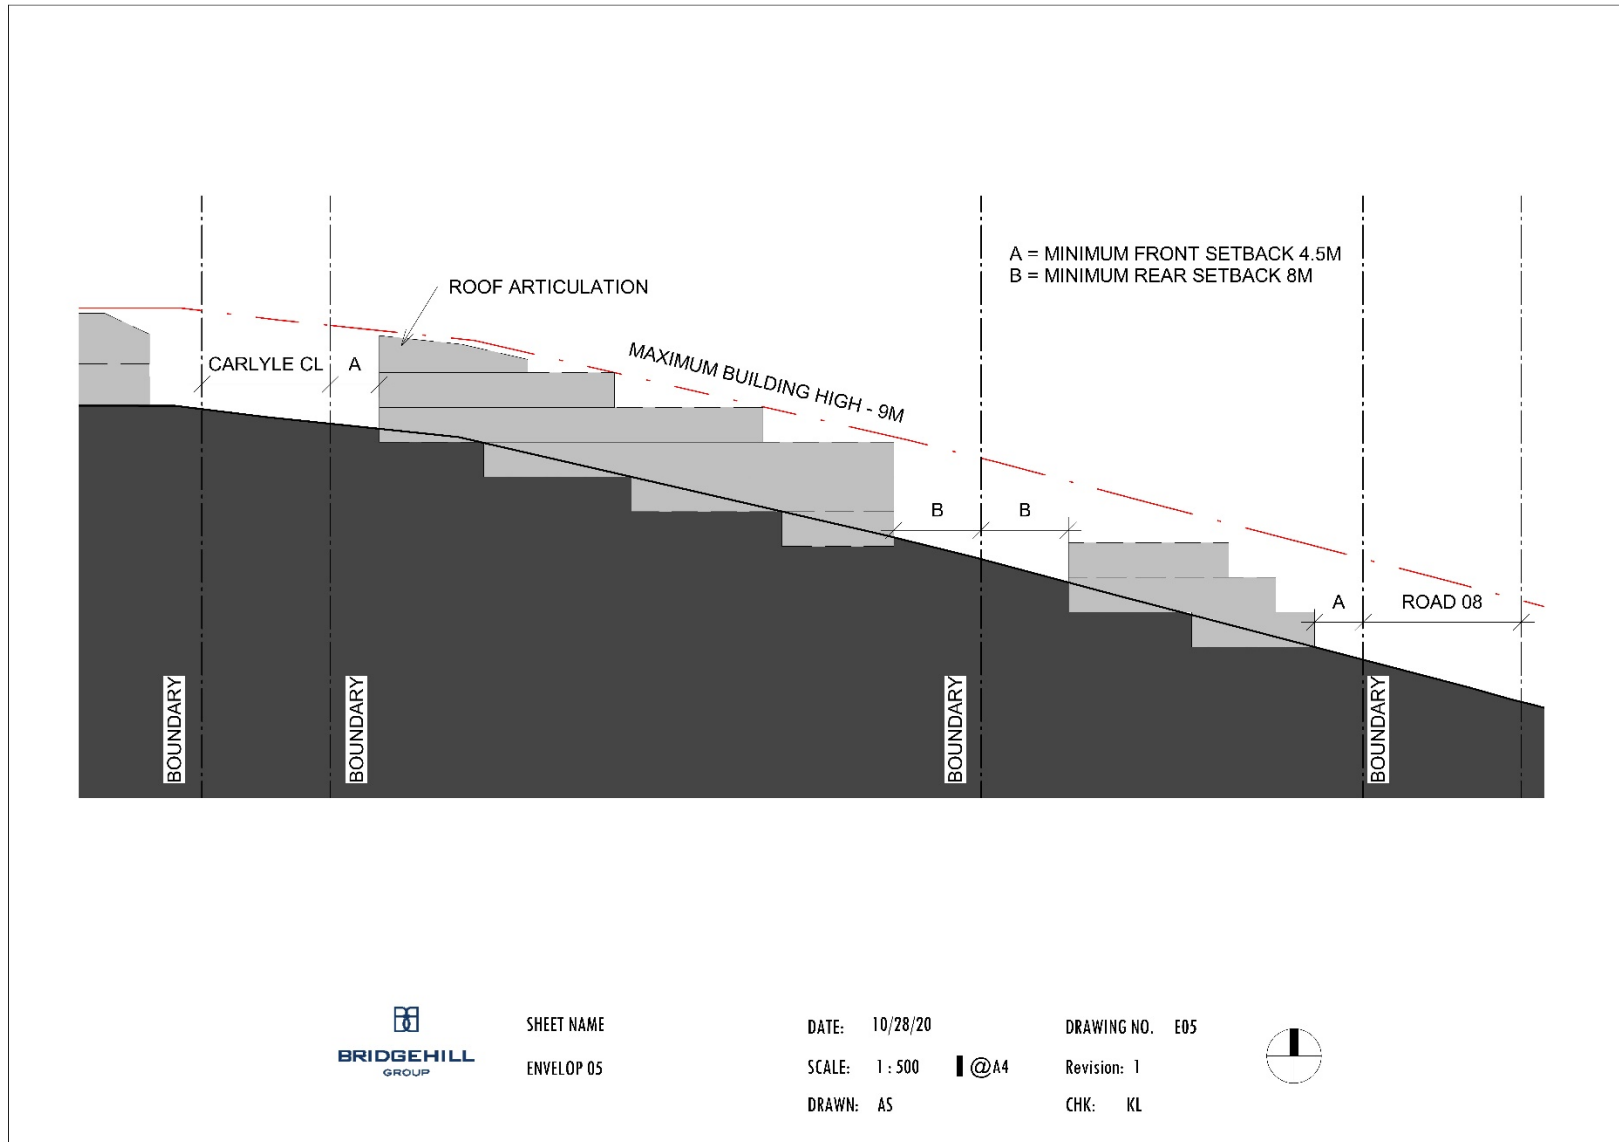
Section view of Building Height, excavation and floor level stepping and roof articulation controls
